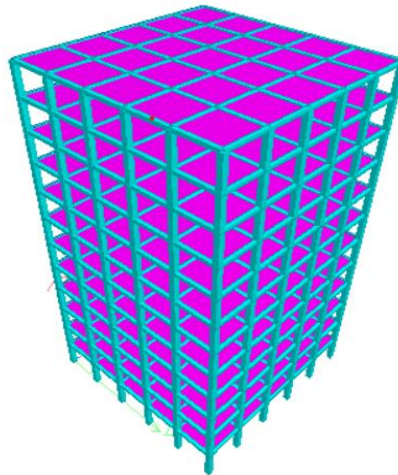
Assigning Beam, Column and Slab Thickness
